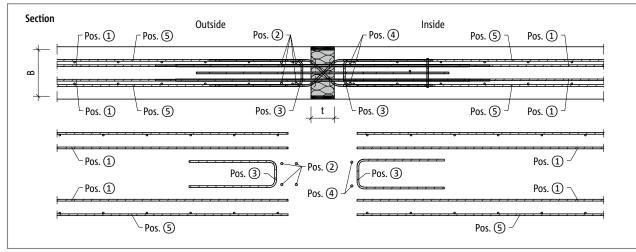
Schöck Isokorb® T type W: On-site reinforcement (layout)
